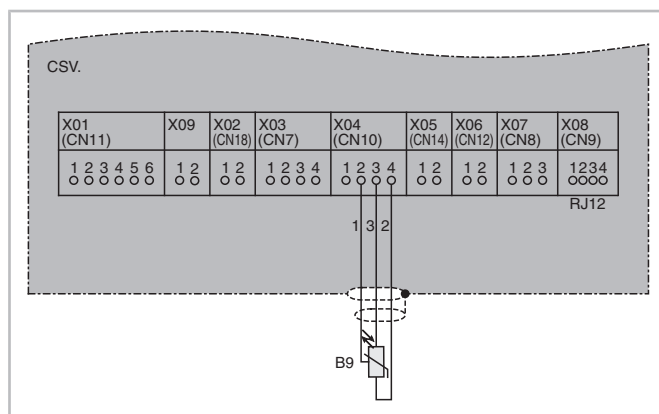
Electrical connection of the optional pressure transmitter B9 to terminal strip X04 (CN10) which is part of the control board located in the lower part of the FI housing
